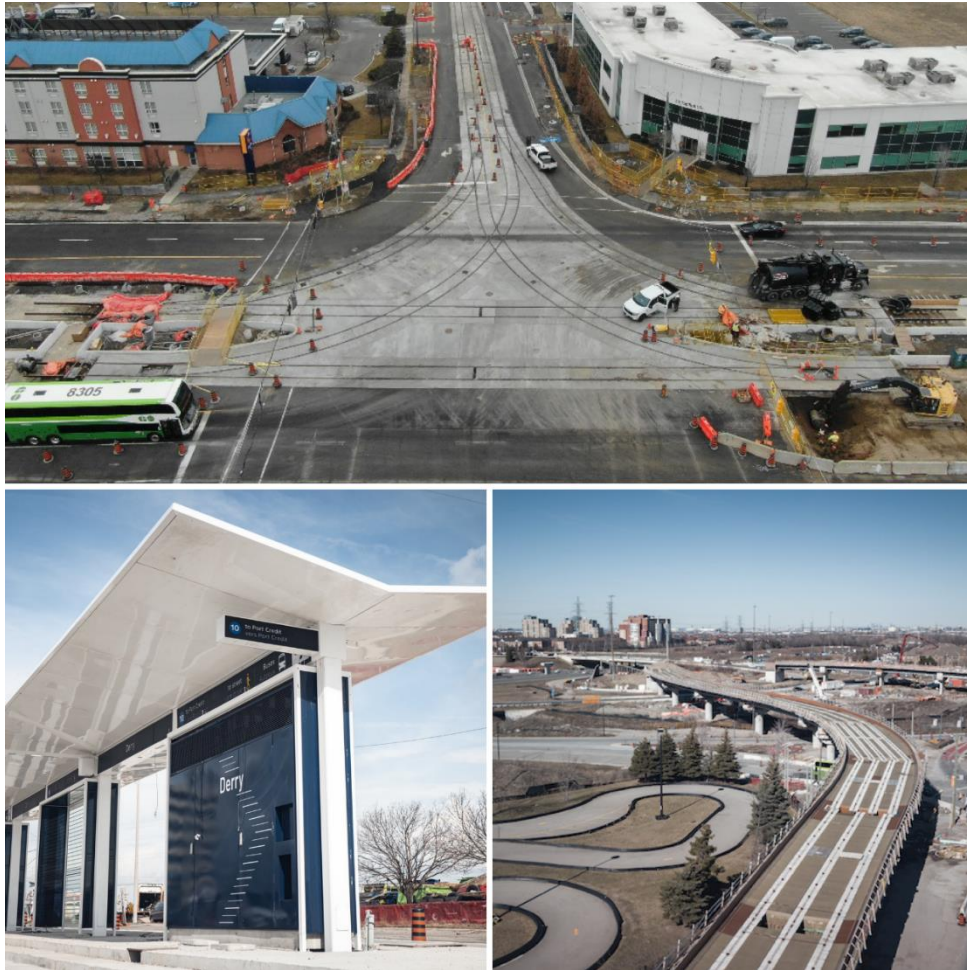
Progress along the HML Corridor including (clockwise) track work at Topflight Drive, station platform placement at Derry Road and elevated guideway across Highway 403.
